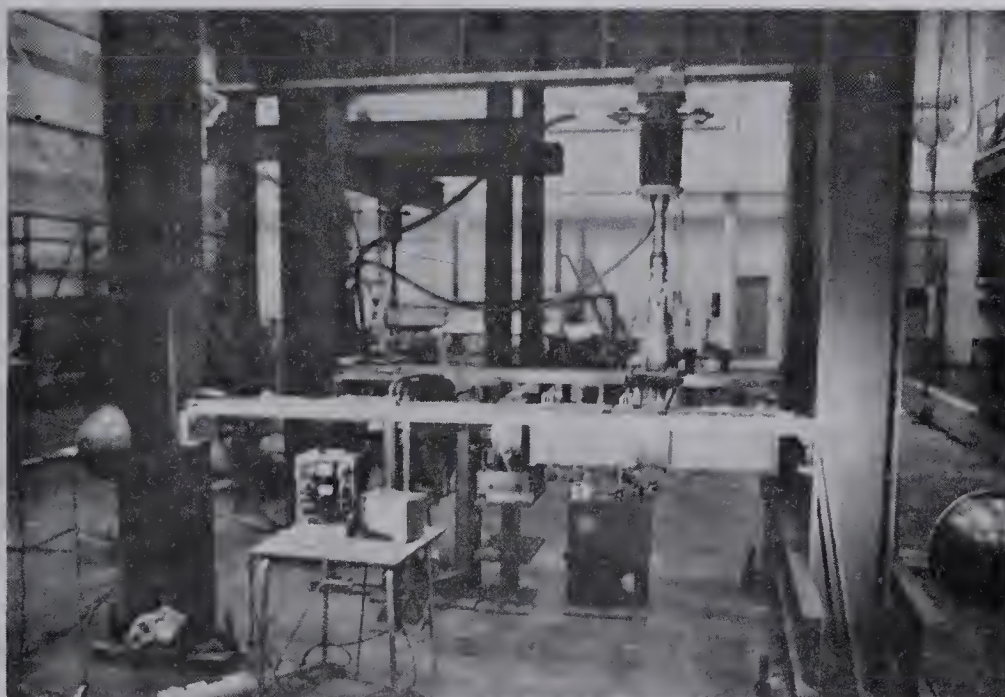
GENERAL VIEW OF TEST SETUP FOR COMBINED BENDING, TORSION AND SHEAR
